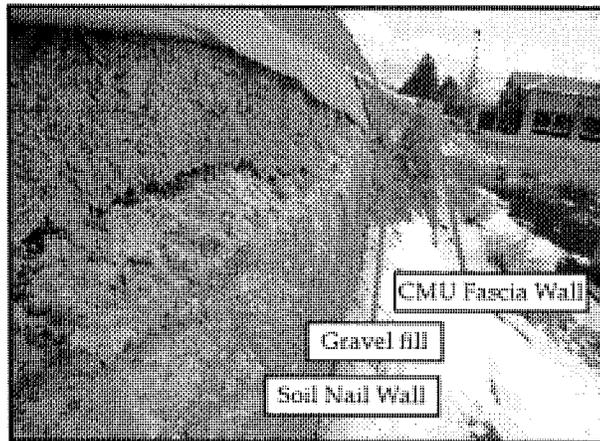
Lateral view of soil nail wall, gravel fill, and CMU fascia wall
